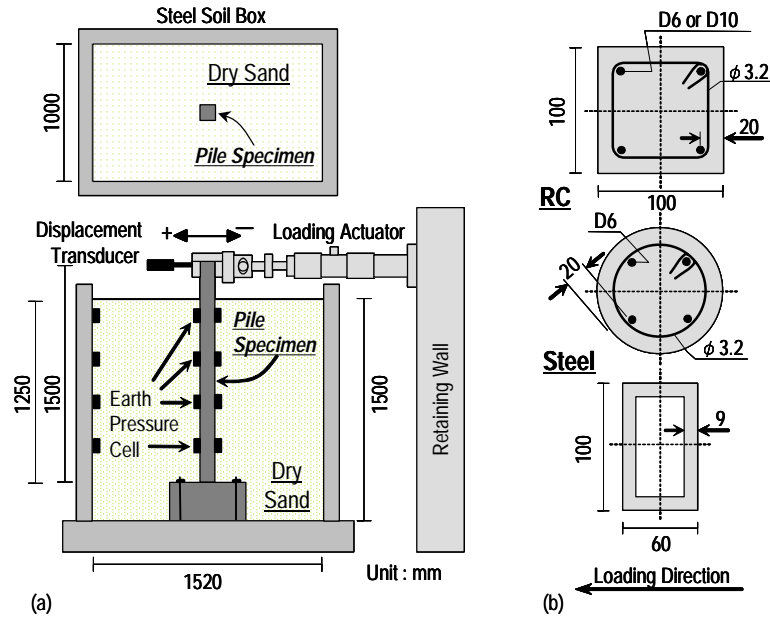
(a) Experimental loading system, and (b) cross sections of test specimens.
